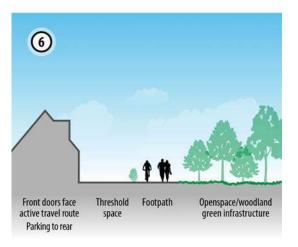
Indicative Street Section 6: Edge frontage overlooking active travel route/green infrastructure.
